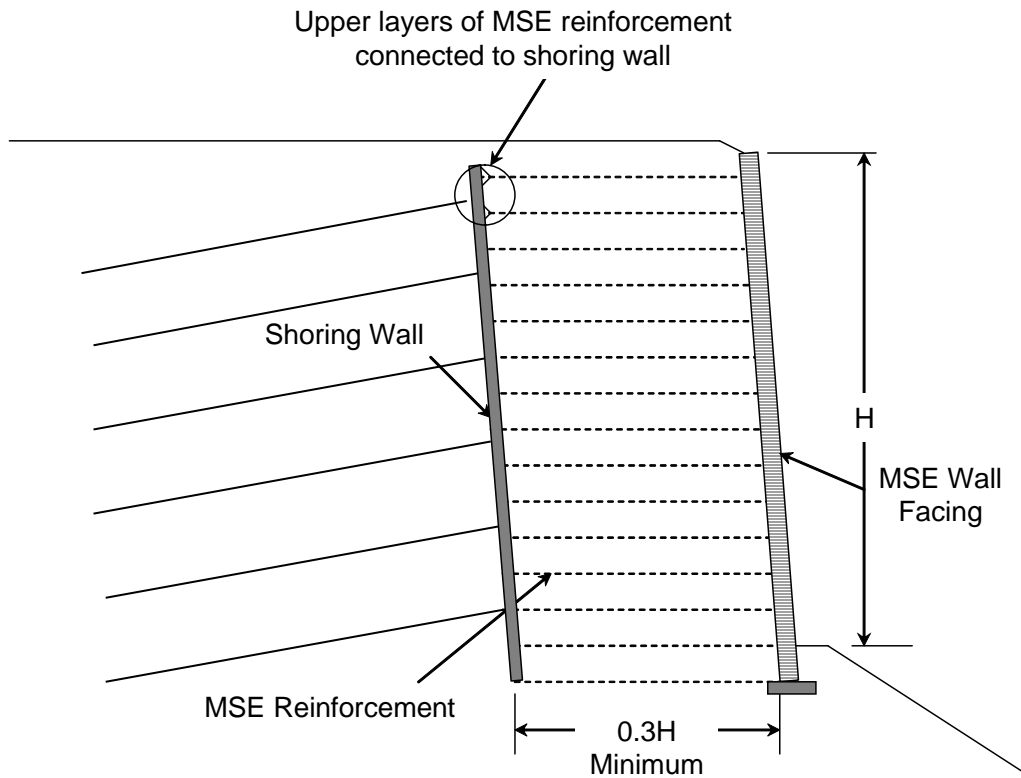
Diagram. Alternate proposed geometry for MSE wall component of an SMSE wall system.
